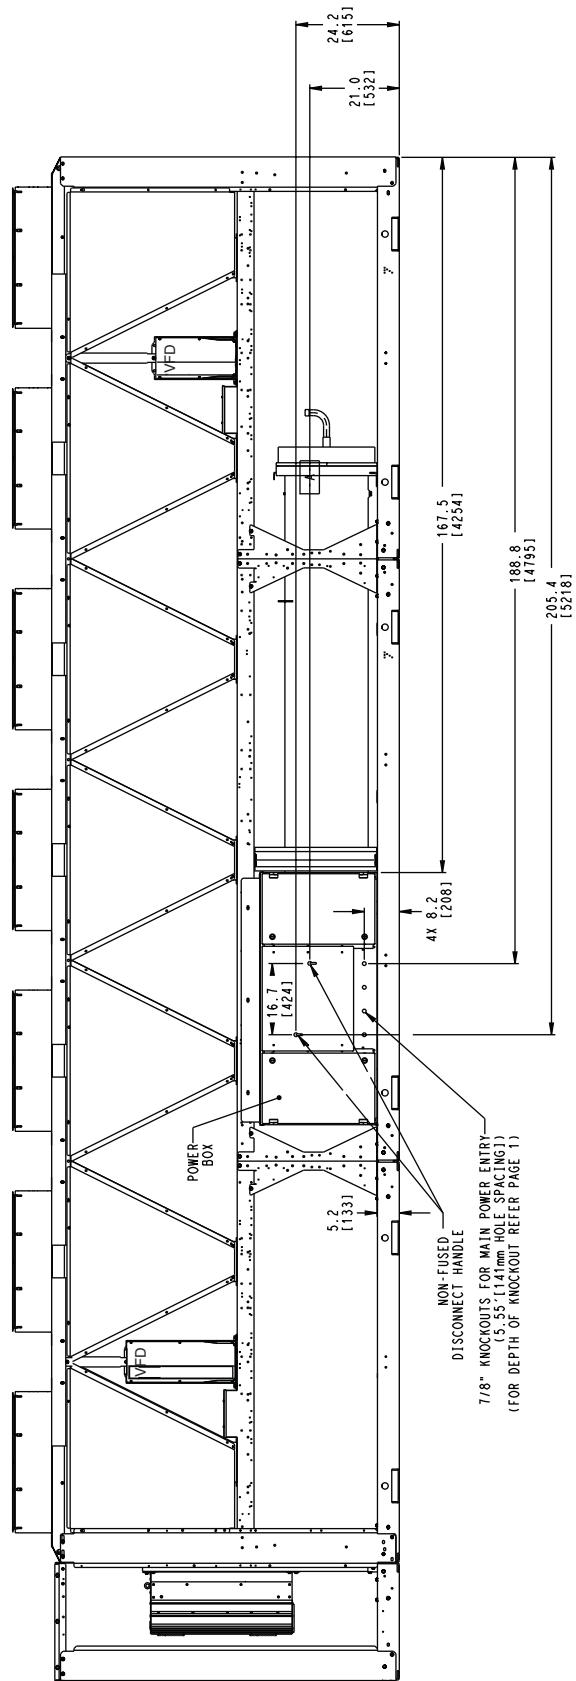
30XA222,242 Air-Cooled Liquid Chiller Dimensions (DX Chiller) (cont)
